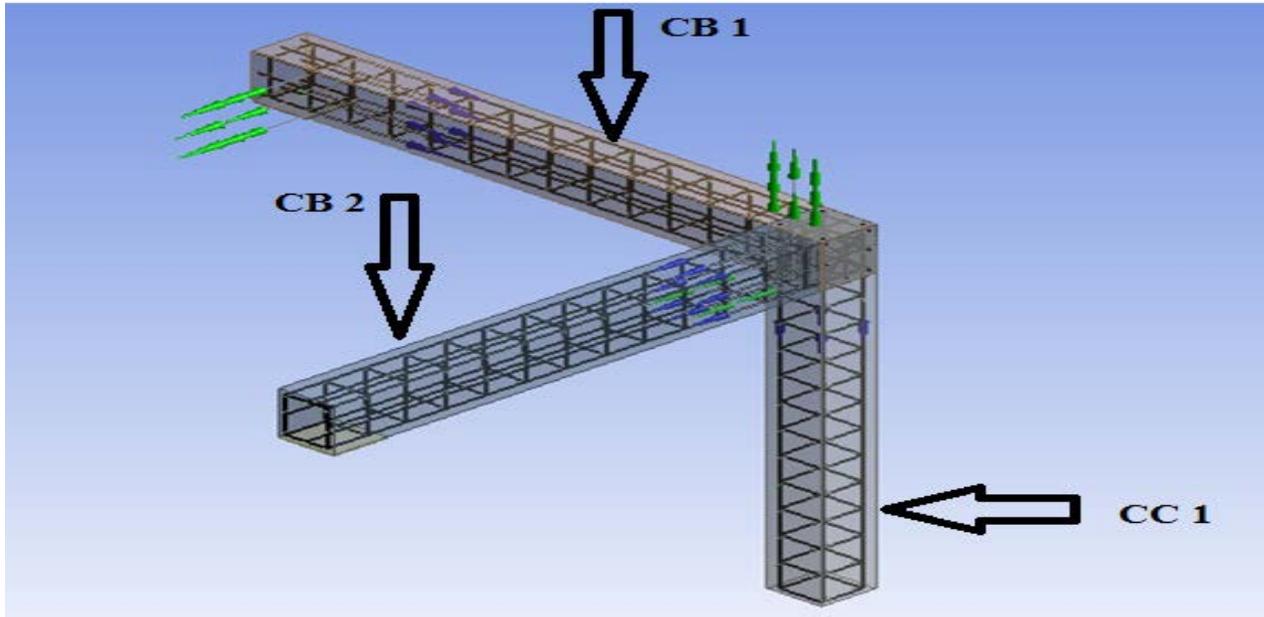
Geometric model and reinforcement detailing of corner joint (CS5)
